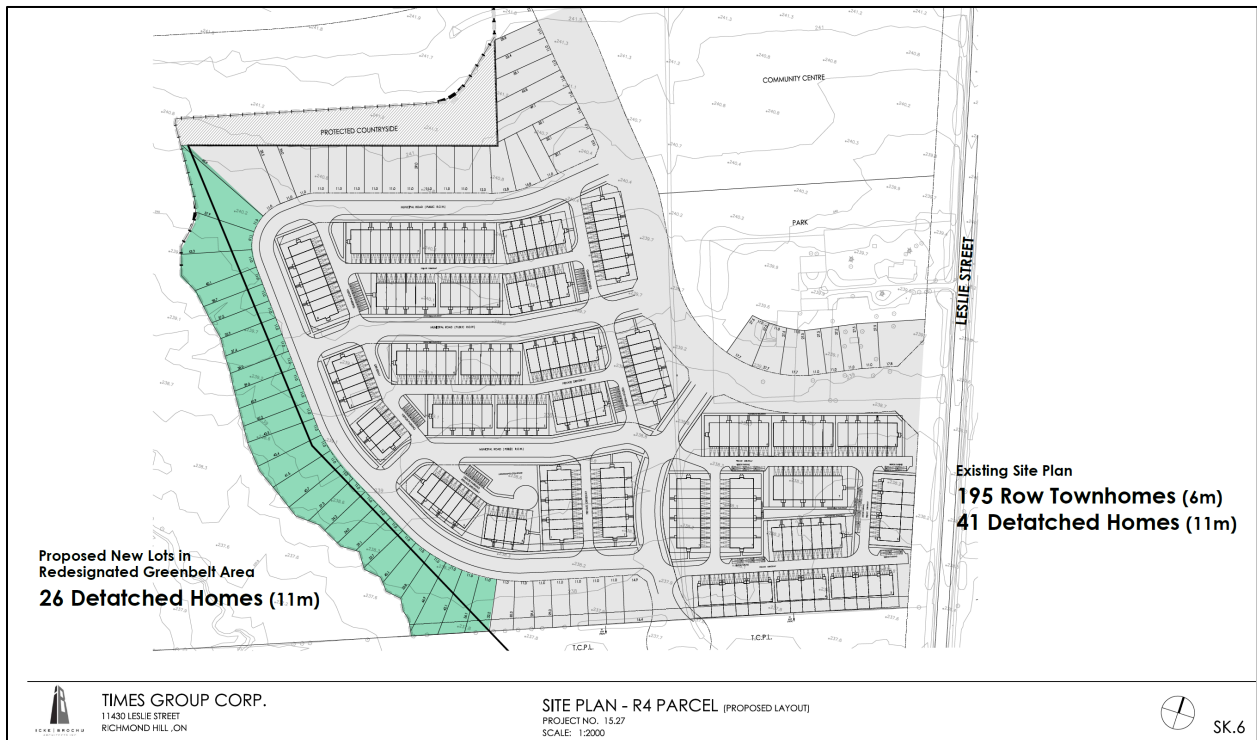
Icke Brochu Site Plan depicting the layout of 26 Net New Detached Single Family Homes in previously designated Greenbelt Areas at 11430 Leslie
